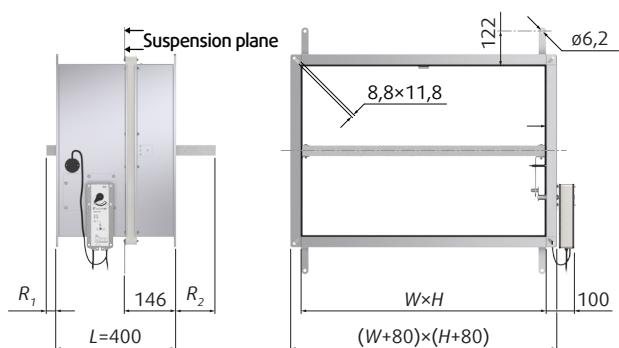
Dimensions of the servomotor controlled rectangular fire damper PKIS
